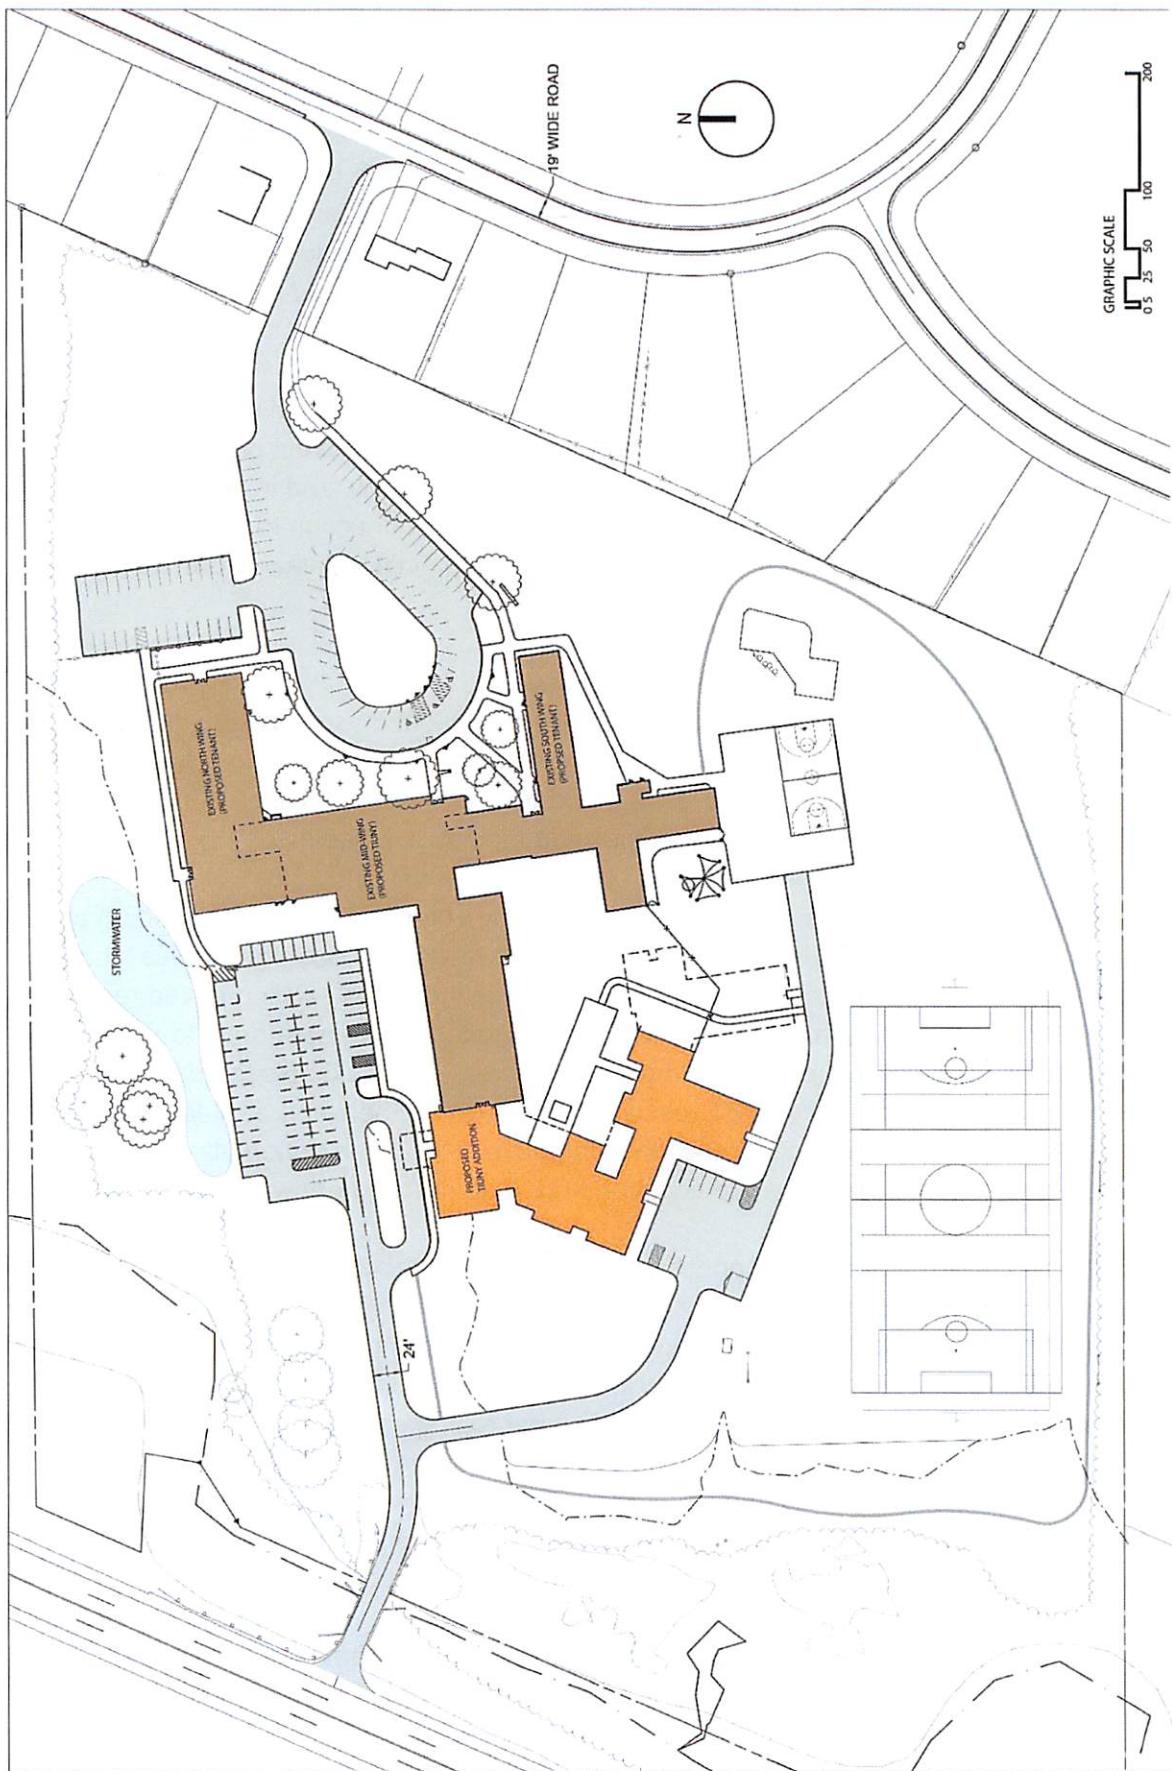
TUNY Concept Site Plan, proposed 2/16/2022.
